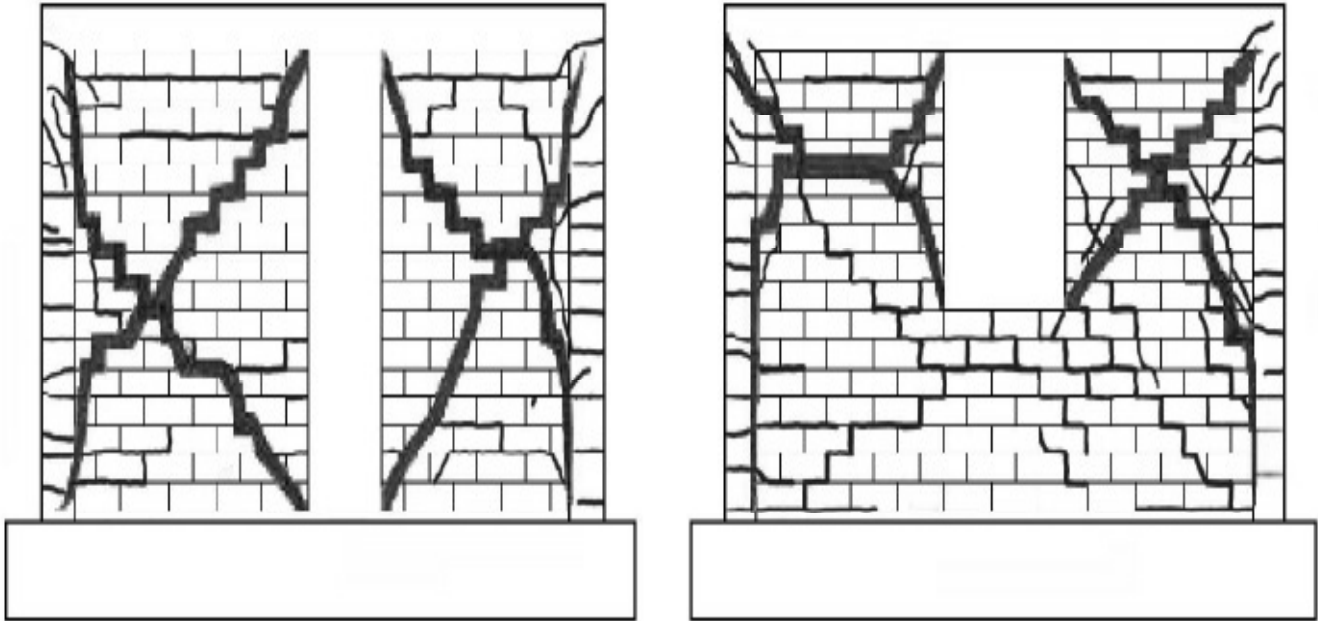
Failure mode in the confined masonry walls with openings
